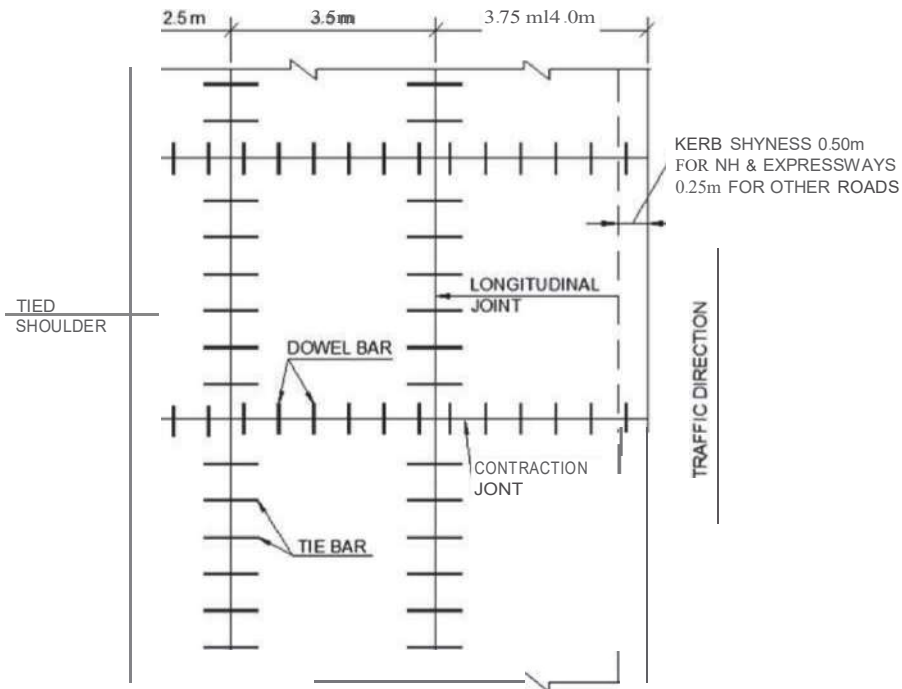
Joints Configuration for each Carriageway of Four Lane Divided Road with Tied Shoulder (Half Cross-Section)
